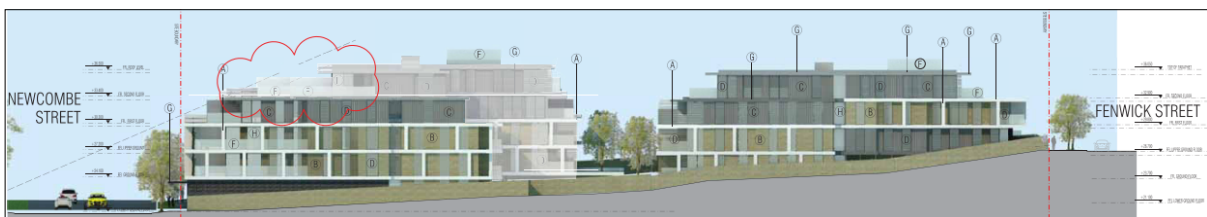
Western Side Elevation showing Newcombe Street and Fenwick Street
